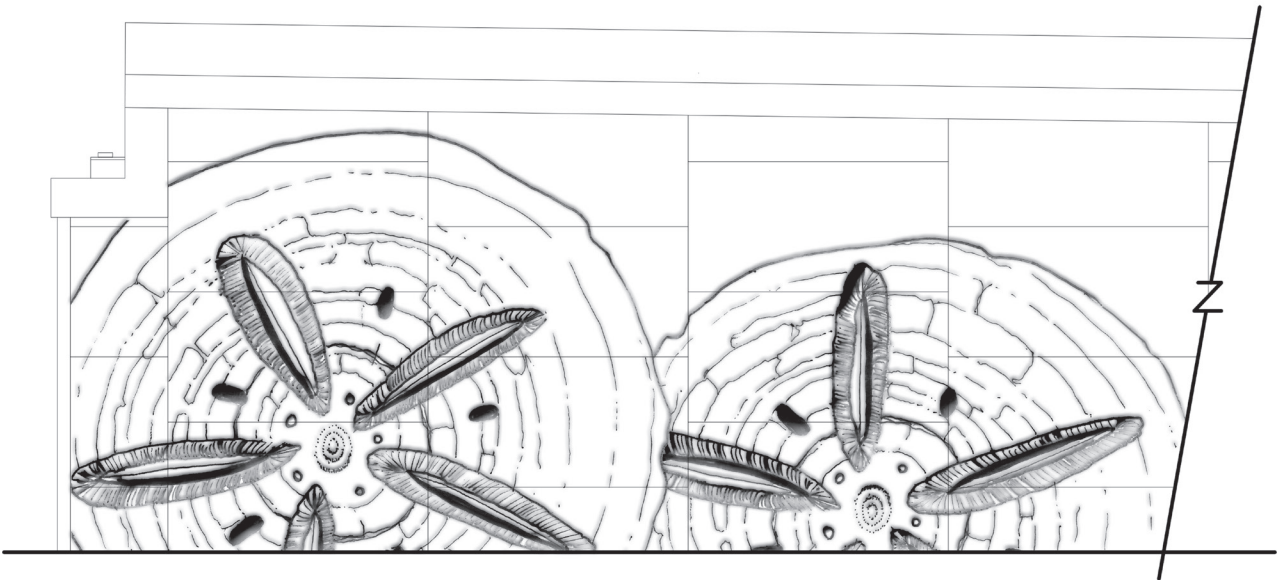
Conceptual retaining wall aesthetics - sample accent graphic
